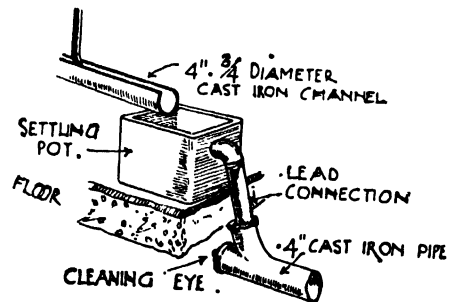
Settling Pot and Connection to Drain slung on Ceiling.
